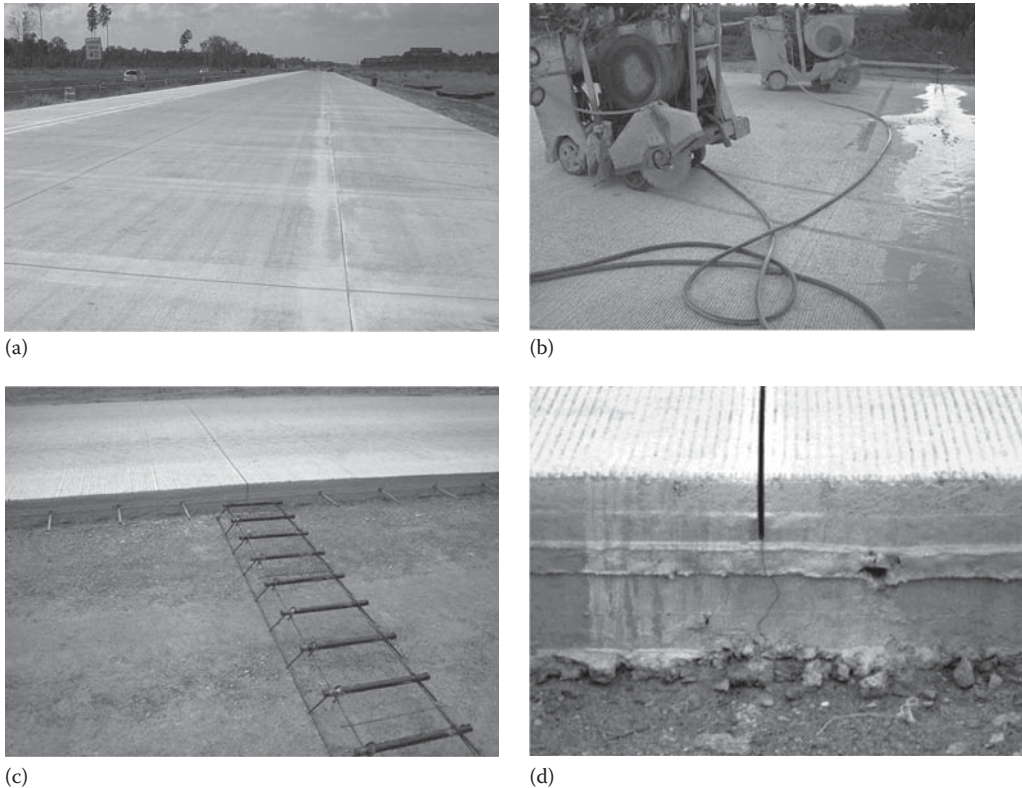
Images of (a) transverse and longitudinal joints, (b) joint saw cutting, (c) dowel baskets set for transverse joint construction, and (d) construction joints.
